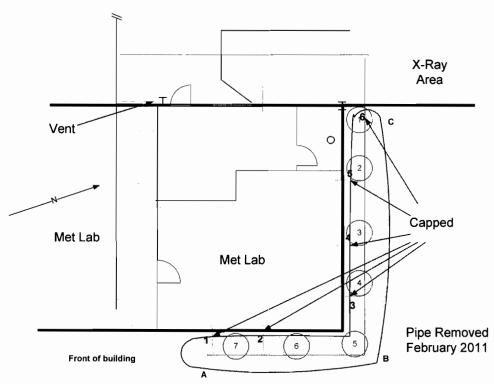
Location of the Seven Soil Samples (pink) and the Six Capped Lines from the Met Lab Drain Excavation
